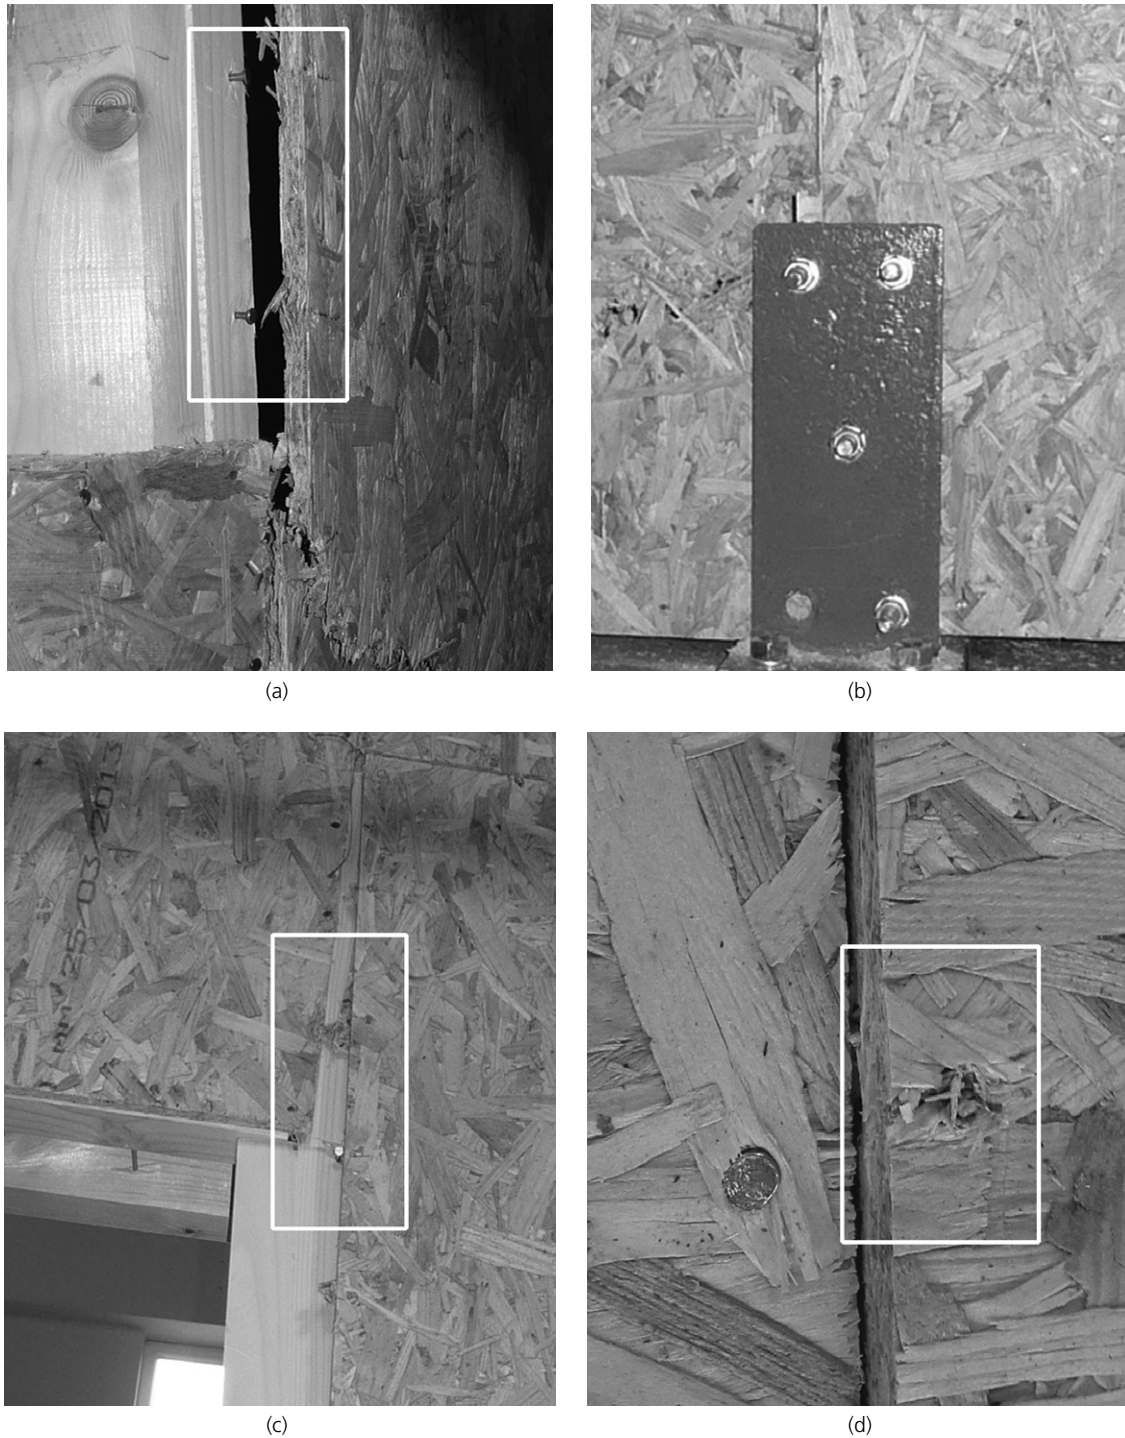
Damage observed in specimens after testing: (a) nails pulled through sheathing panel; (b) shear crack in OSB panel; (c) panel edge tear-out; (d) nail head embedded into panel
